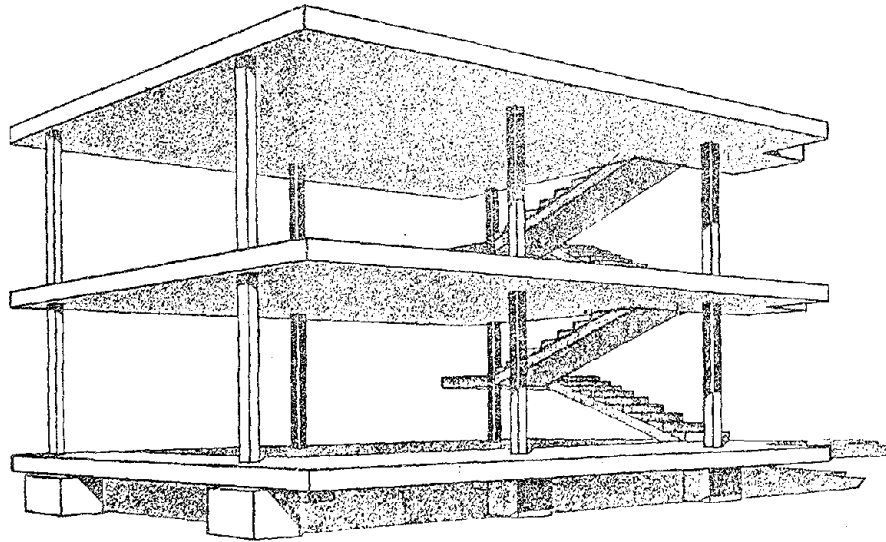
Construction of the Cultural Center was of concrete frame and masonry infill.
